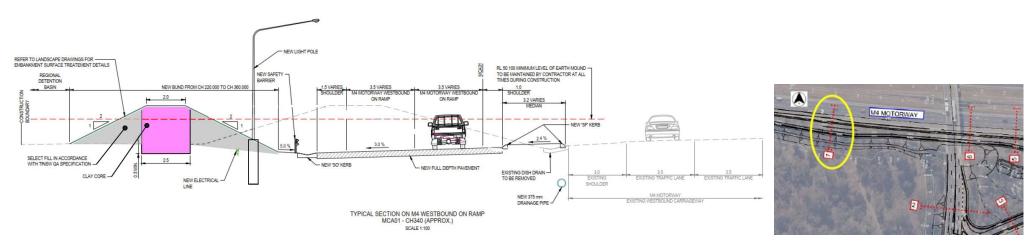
Typical cross section (looking west) on the proposed on-ramp (merge lane) including the proposed bund running along the southern extent of the M4 Motorway.
